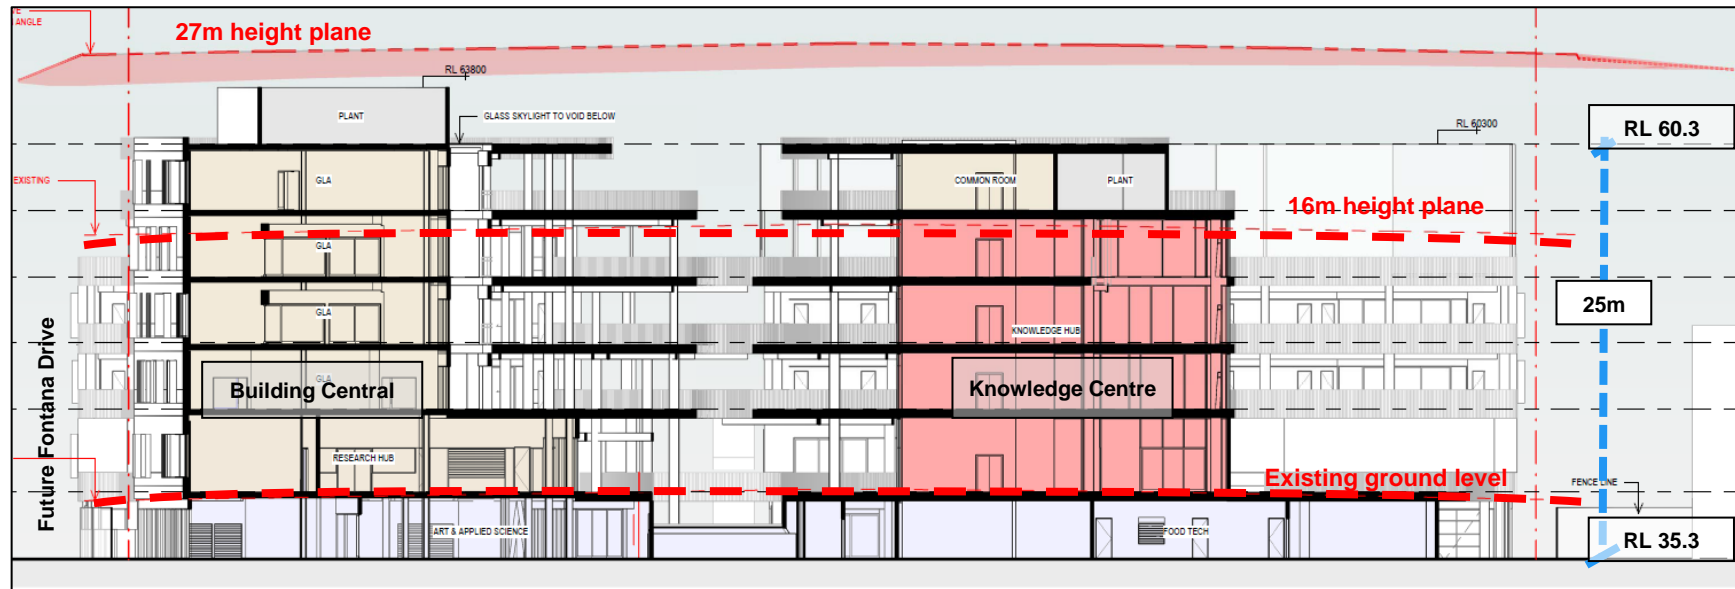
| East-West section through the site (Source: Applicant's SRtS)
